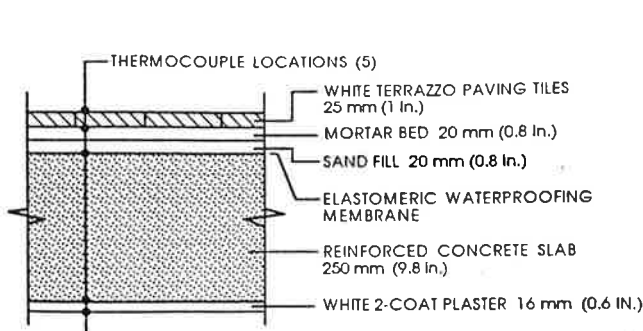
Roof 1: uninsulated poured-in-place concrete slab.
